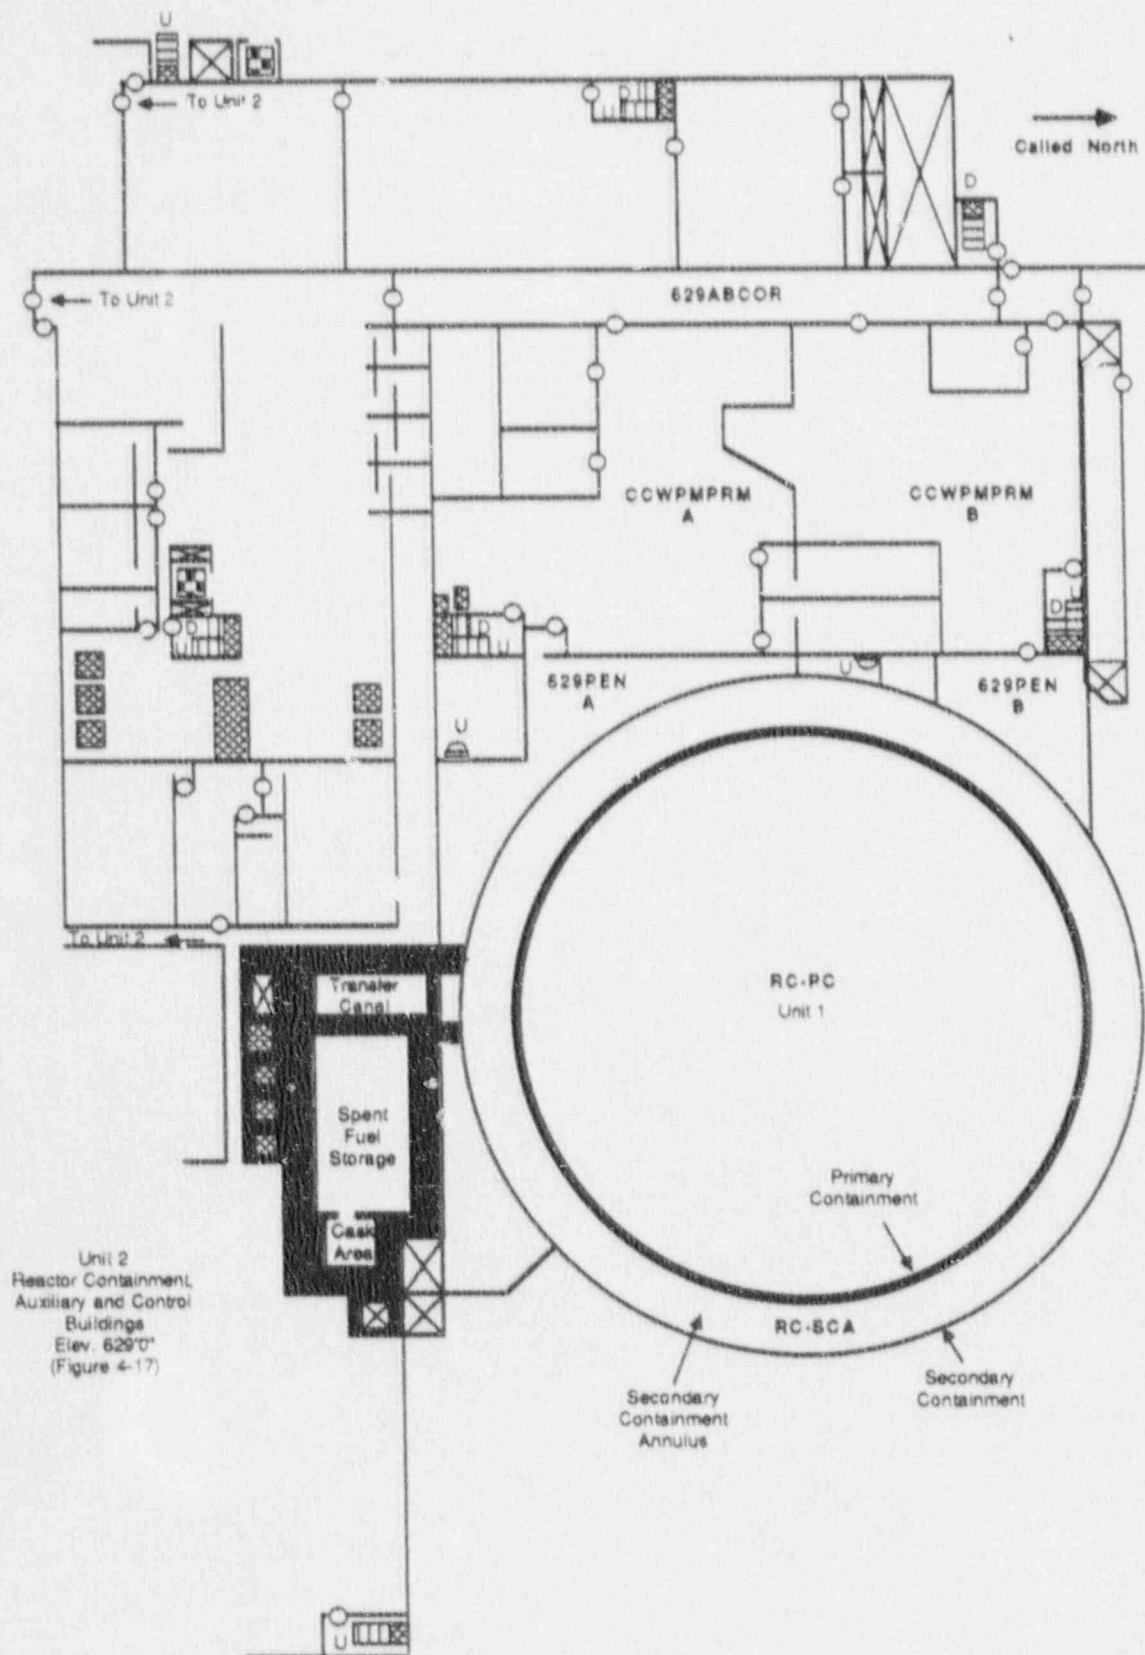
Bellefonte 1 Reactor Containment, Auxiliary and Control Buildings, Elevation 629'0"
